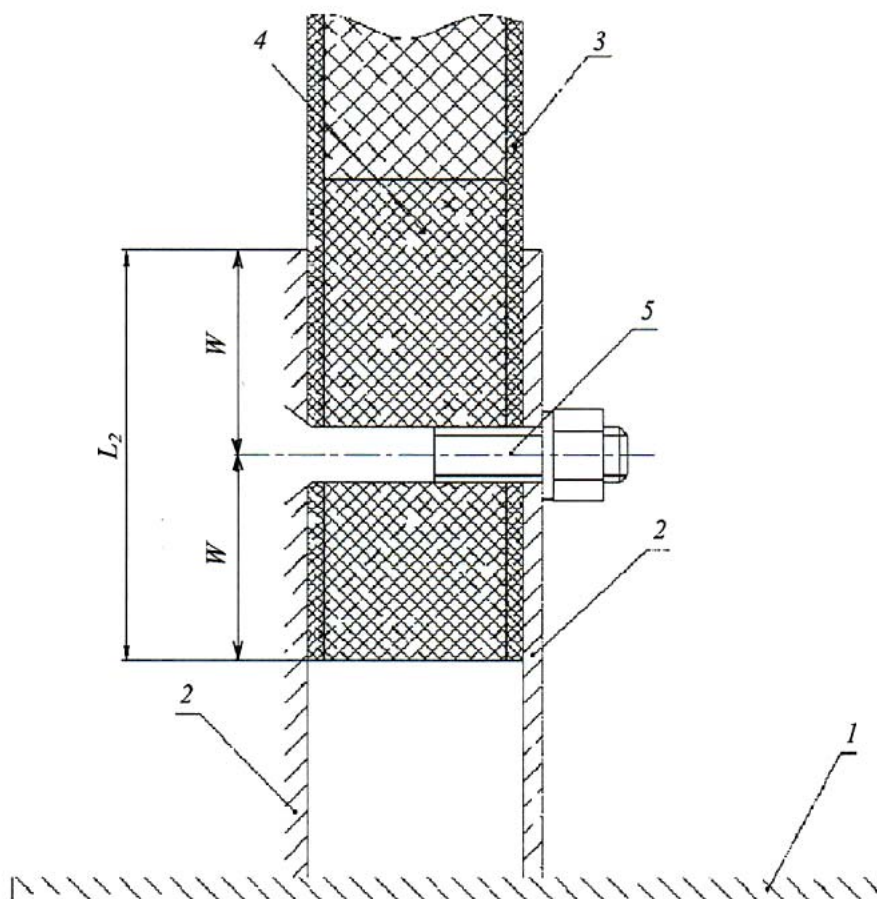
Bonded and bolted joint of the bulkhead to the metal hull (with two metal coamings):
